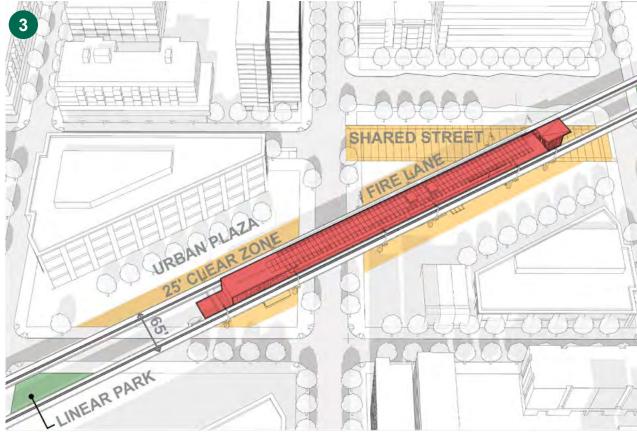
D - Elevated Station cutting at a diagonal to the existing street grid
